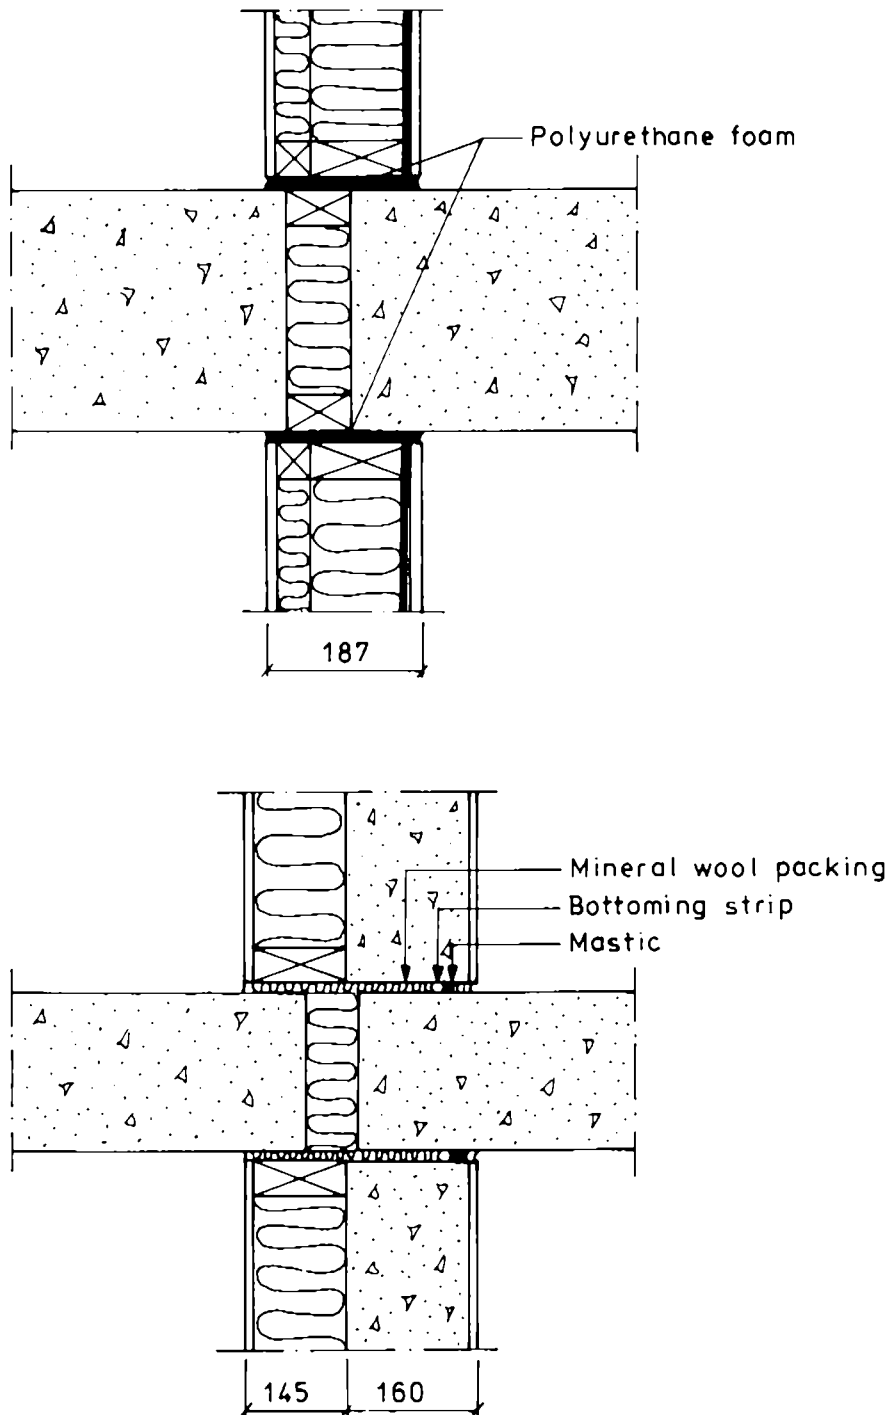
Joints in two different external wall constructions against joist structures at balconies. Bearing in mind that, for structural reasons, it may be necessary to reduce the insulation thickness between the edge of the joist structure and the balcony, it is particularly important that the cold bridge effect is not amplified by air leakage. Airtightening must therefore be carried out carefully. The example shows two different ways of achieving airtightness – polyurethane foam and mastic respectively.
